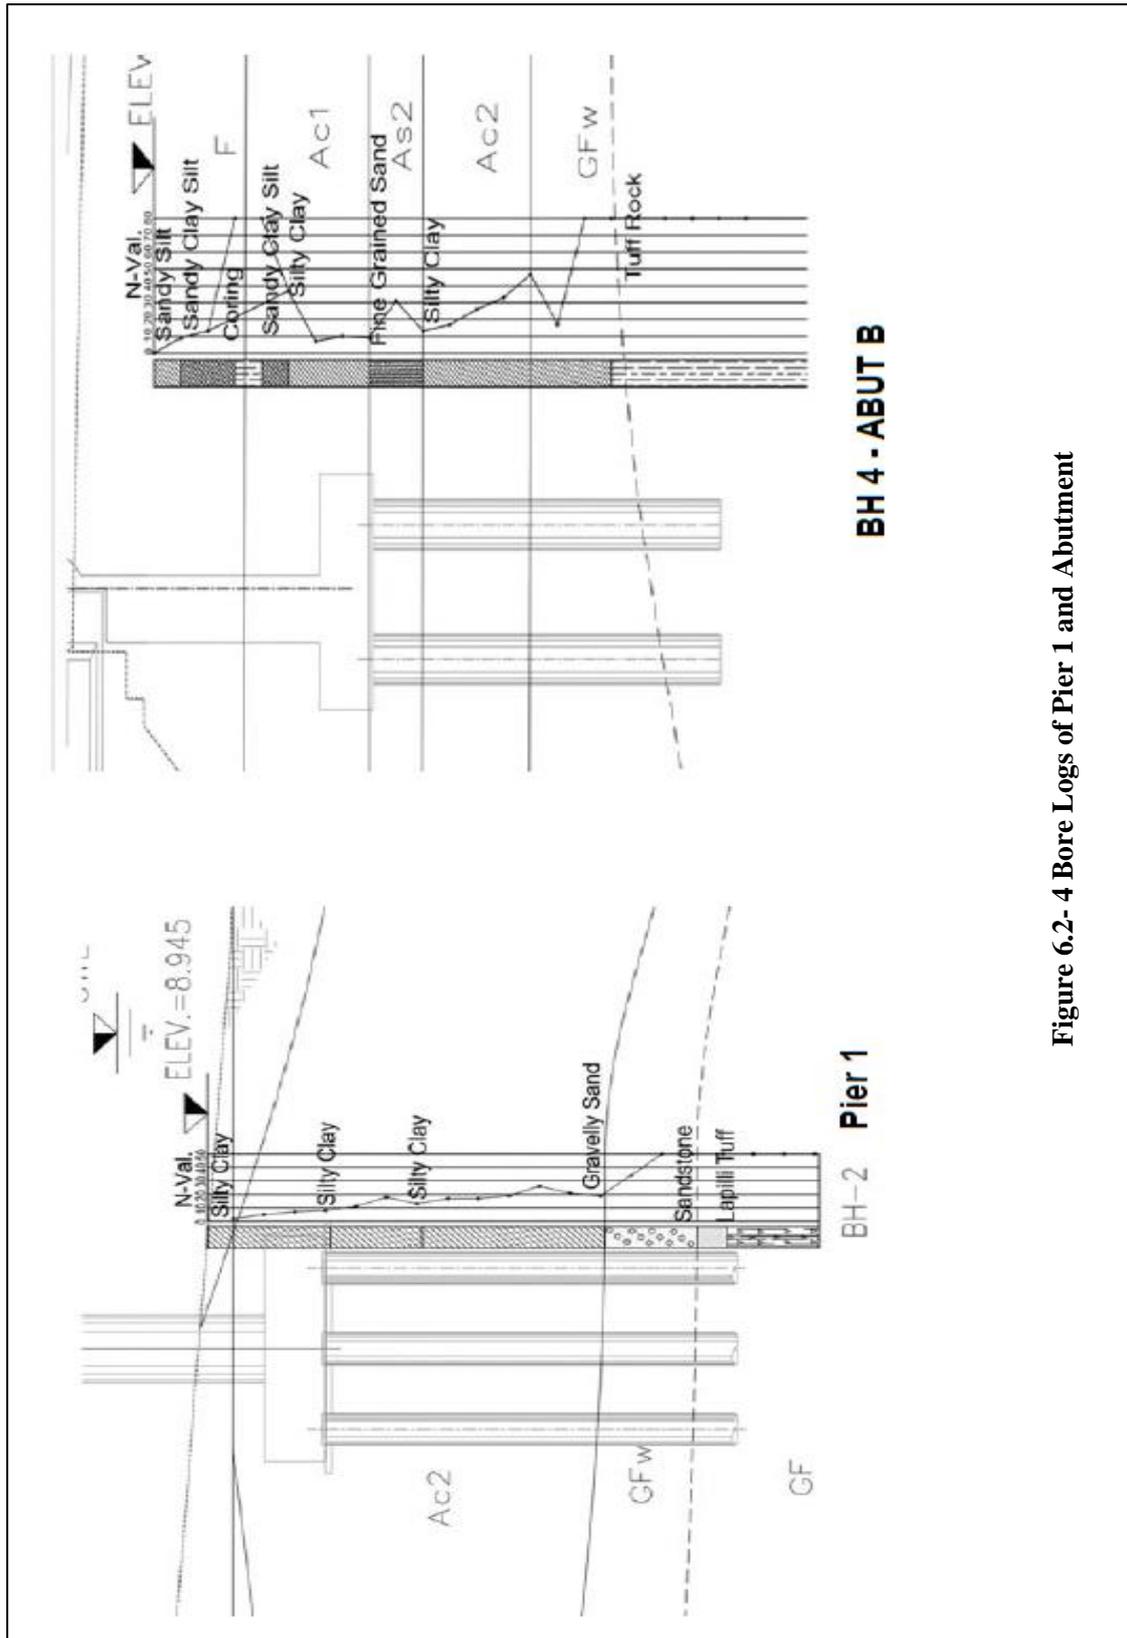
4 Bore Logs of Pier 1 and Abutment
